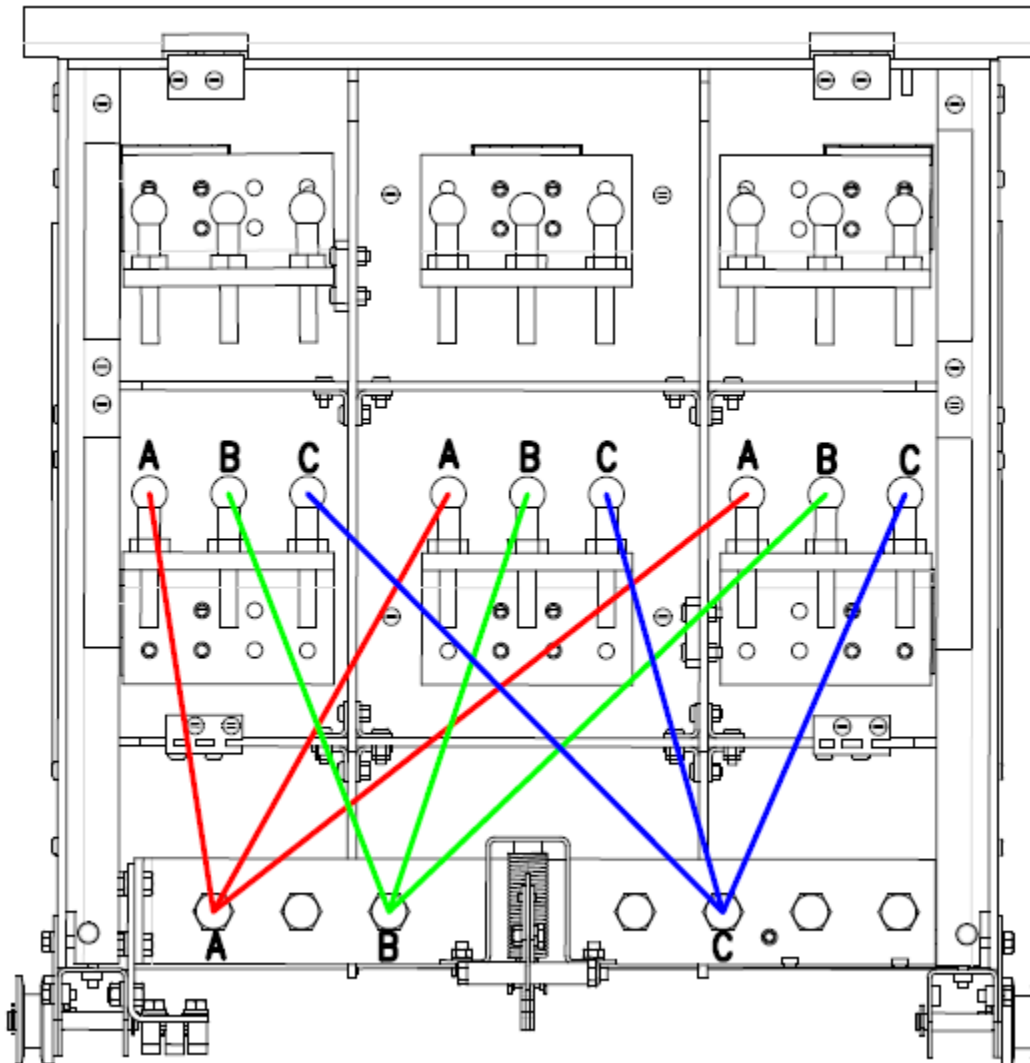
Typical mounting of a three Cable Ground Set. This unique mounting configuration is required in order to protect against single phase faults. The connection shown in this figure is for a bottom terminal connection. The same connection method should be used for a top connected system.
